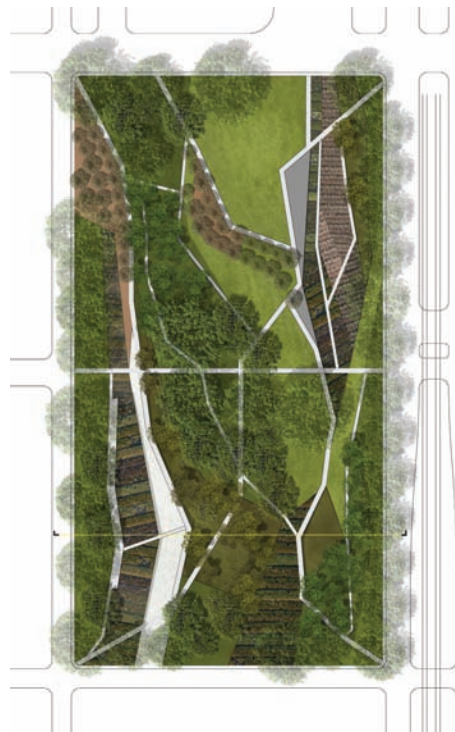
AutoCAD and Photoshop site plan, Palmer Park, New Orleans, LA.
